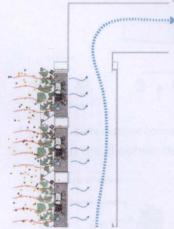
Green wall section image, source; petify.co, *Living Walls Vertical Gardens and Green Walls
